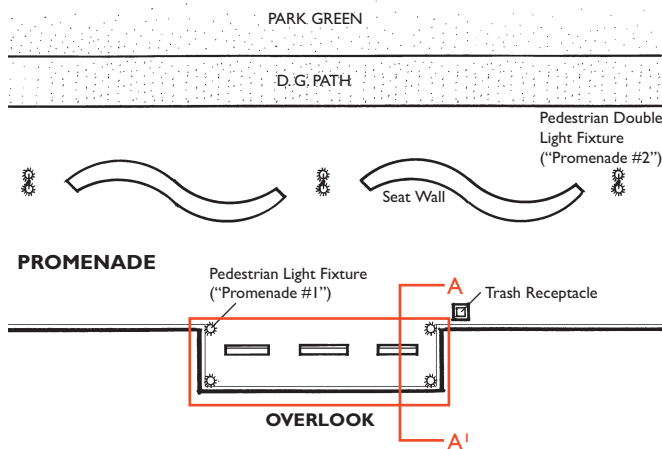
C.4: Plan of Proposed Promenade Overlook (Option 1)
